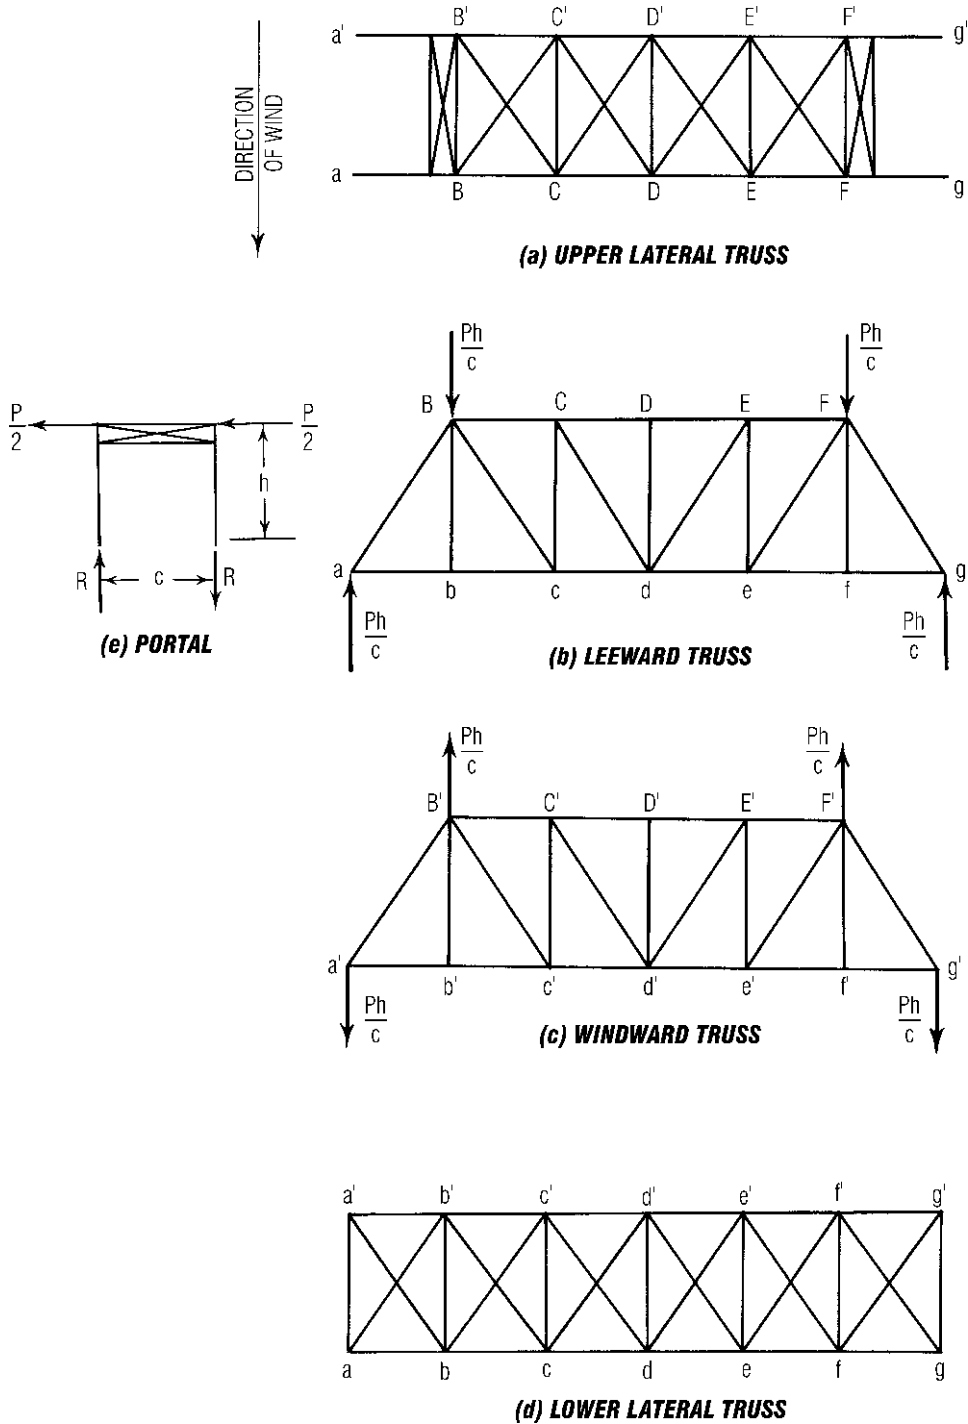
Lateral trusses for bracing top and bottom chords of bridge trusses.
